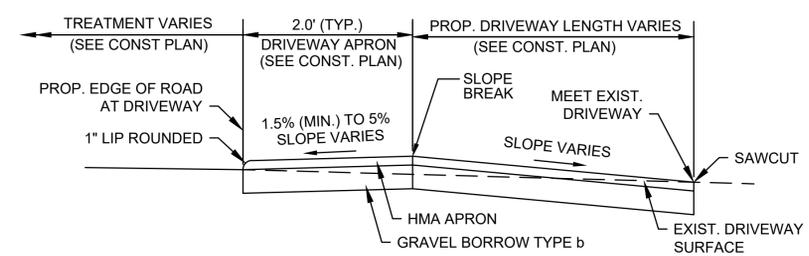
DETAIL FOR DRIVEWAY WITHOUT SIDEWALK (W/O BERM)
